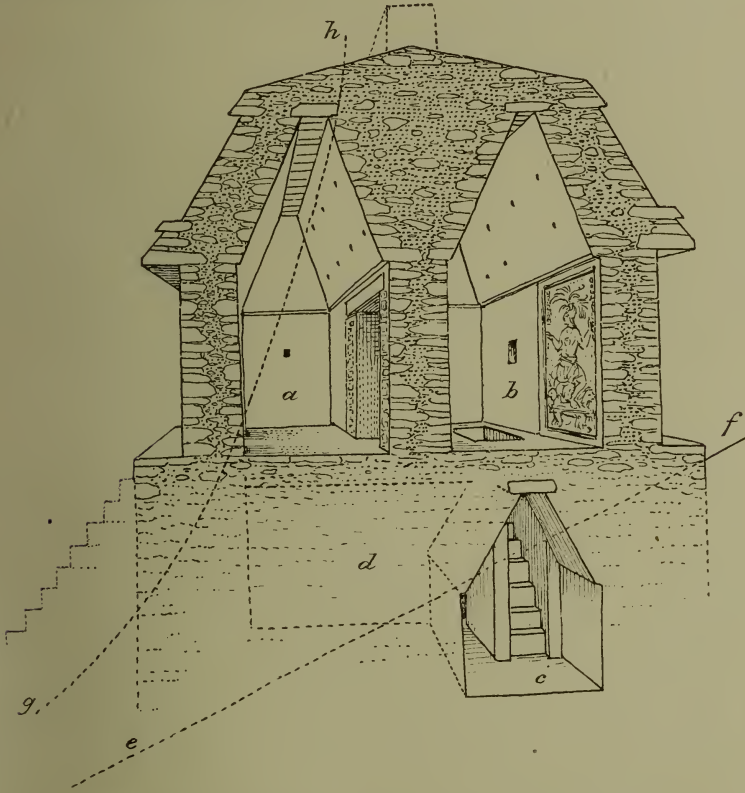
SECTION AND PERSPECTIVE OF THE TEMPLE OF THE BEAU RELIEF.
